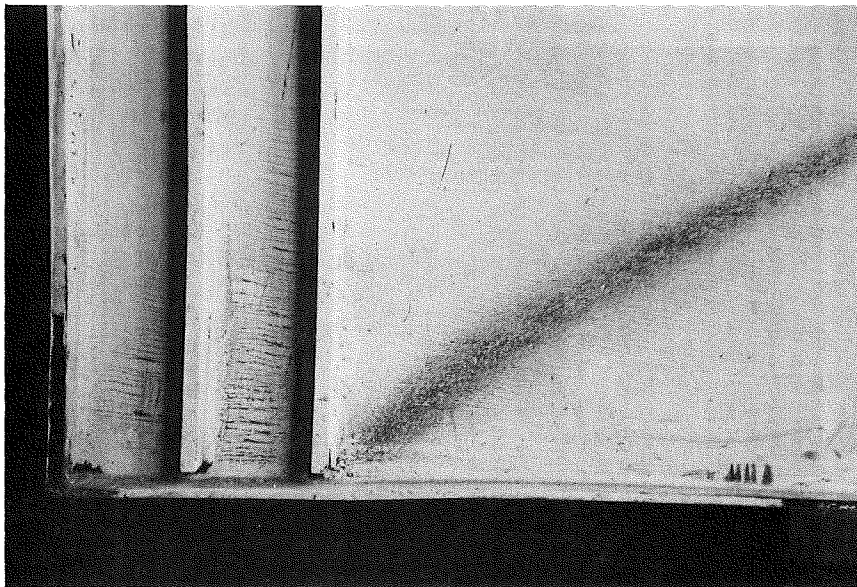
Yielding at Stiffener and Bending of Bottom Flange
